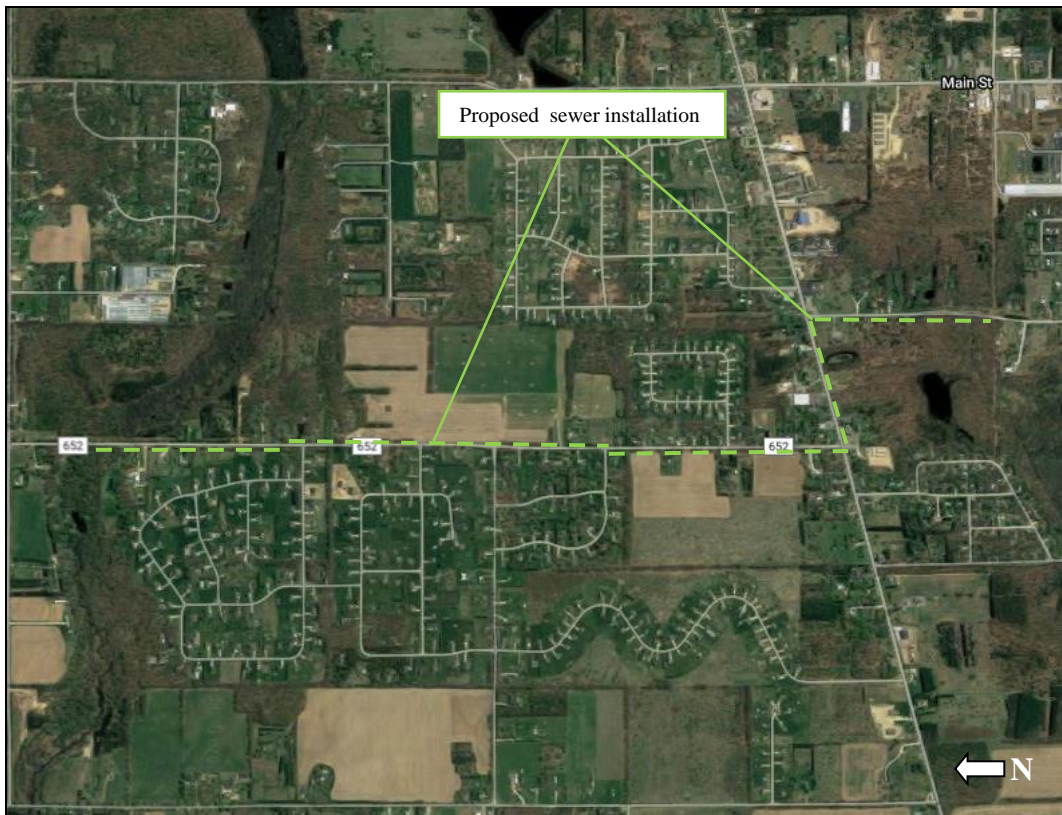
Aerial photograph showing the proposed sewer installations within the road right-of-ways.
